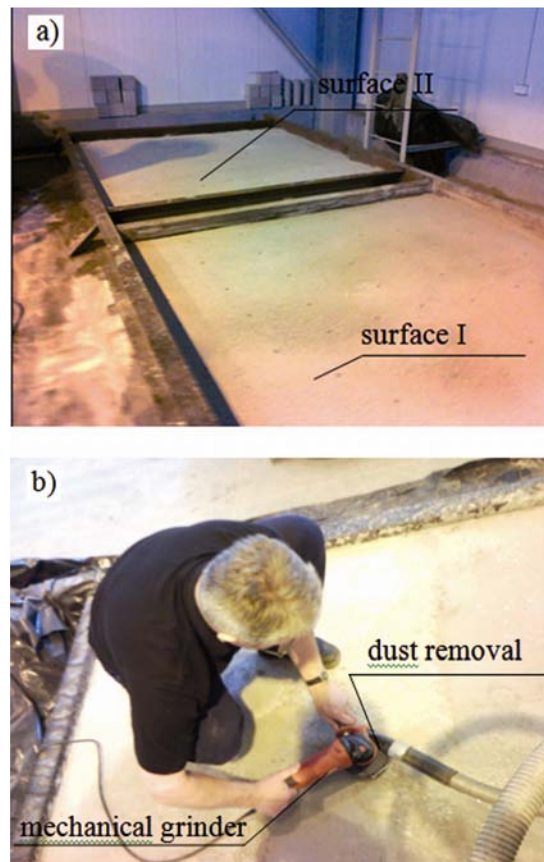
Concrete floor base specimens: (a) laboratory stand, and (b) preparing the base concrete surface by mechanical grinding and dust removal.
